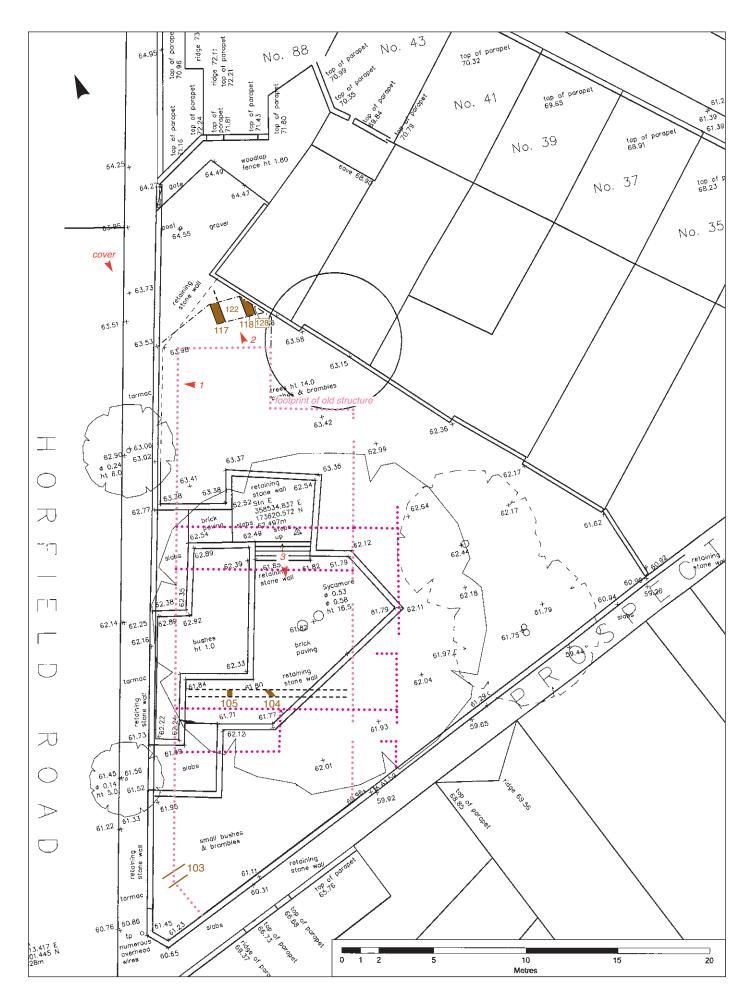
Site plan, scale approx. 1: 200 @ A3, showing key features and plate directions
